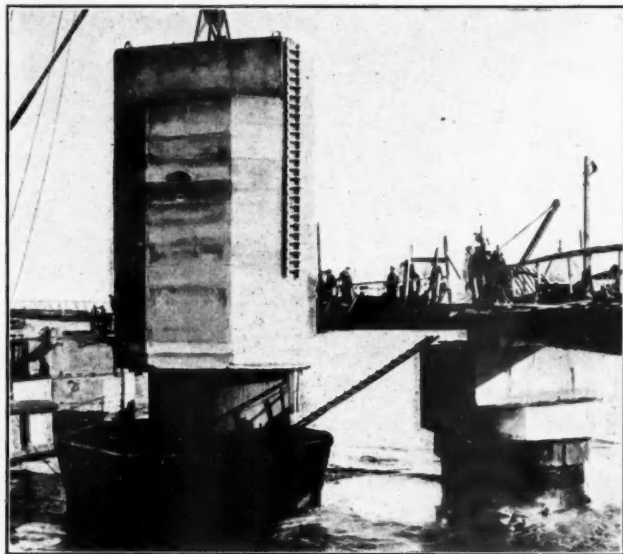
Plate N. Concrete Cofferdams surmounting the Viaduct Piles.
